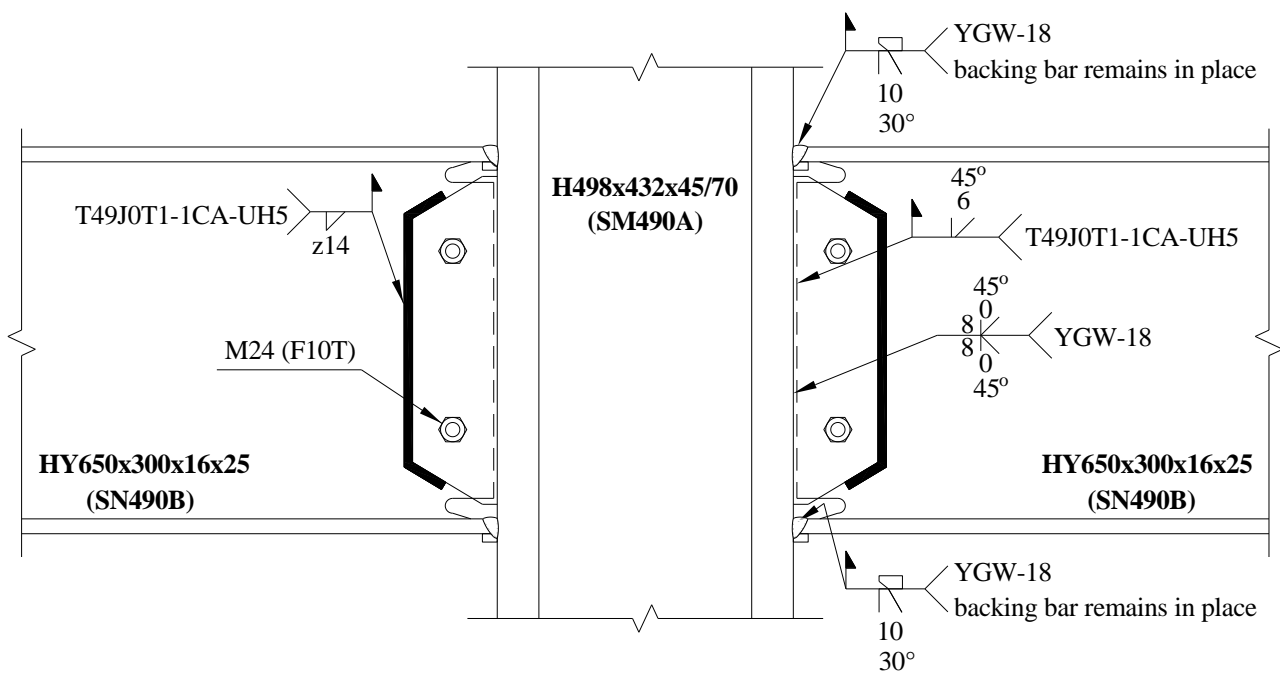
Beam-to-column connection detailing of Specimen 1.
